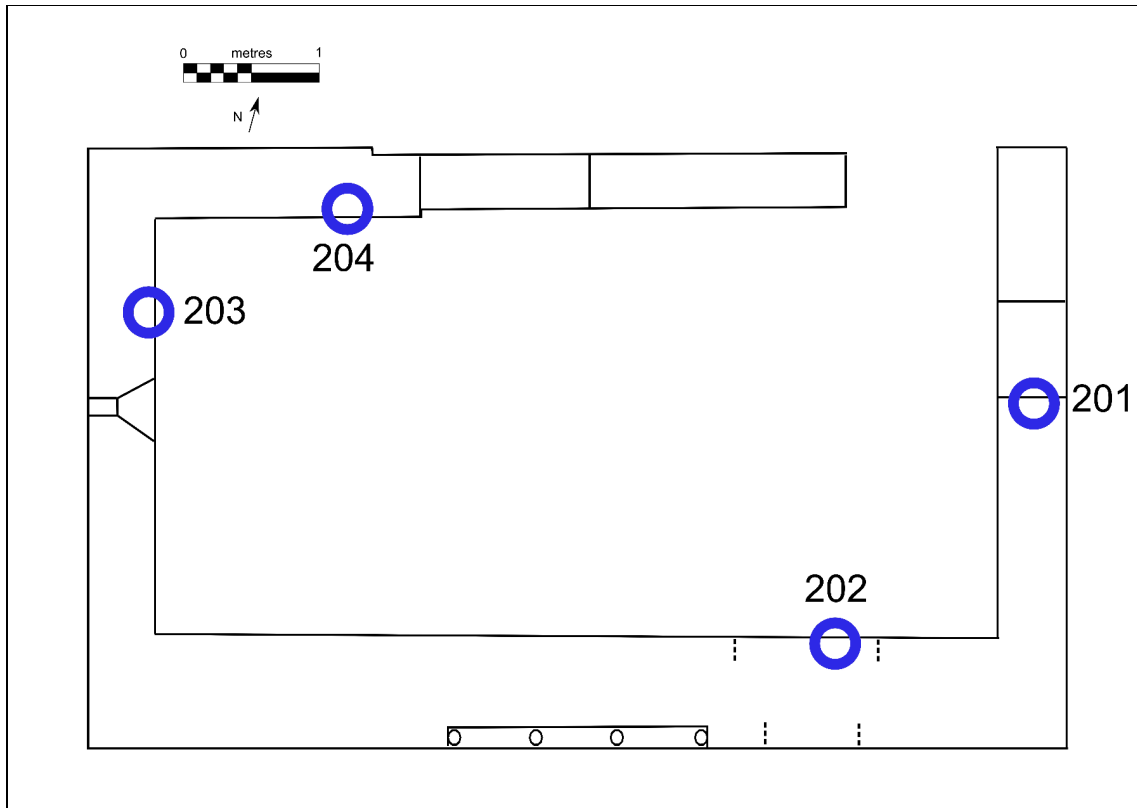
Plan of Chapel Barn showing location of mortar sample points, May 2020 (see Appendix C for details).
